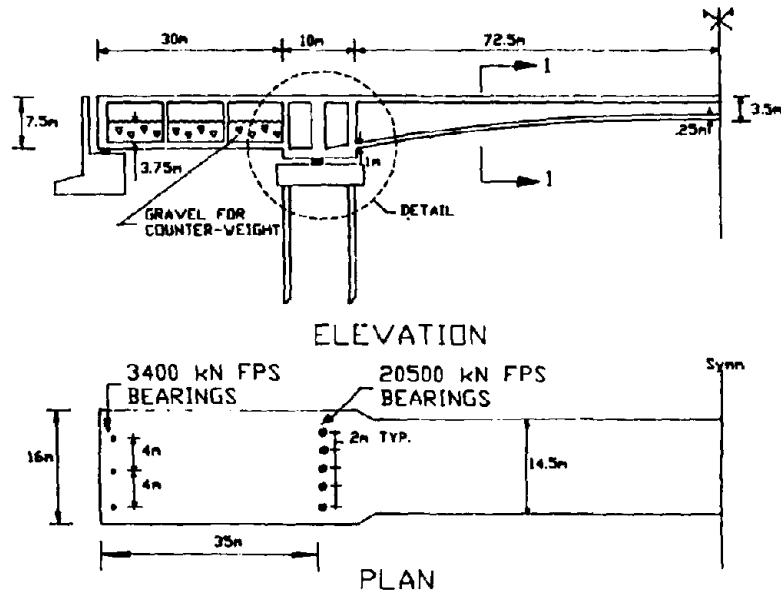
Plan and Elevation of Seismic Isolated Corinth Canal Bridge.
